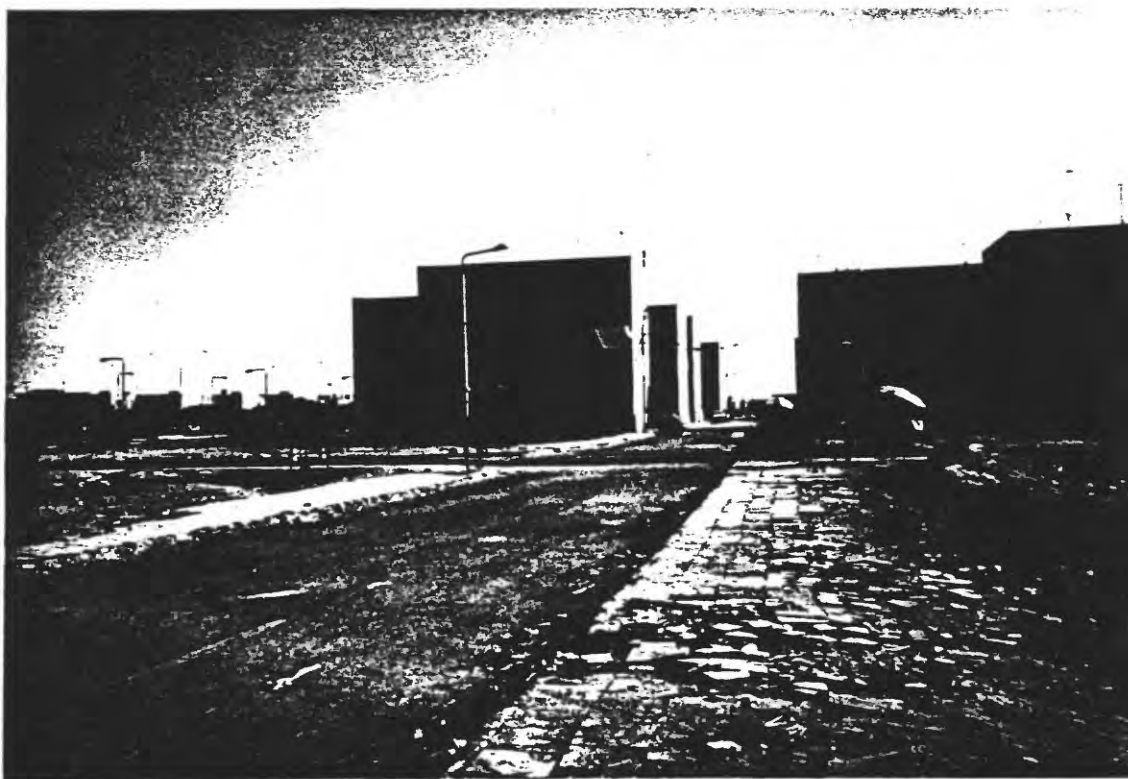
"10 Ramadan City" -- Precast panel shear wall construction.
